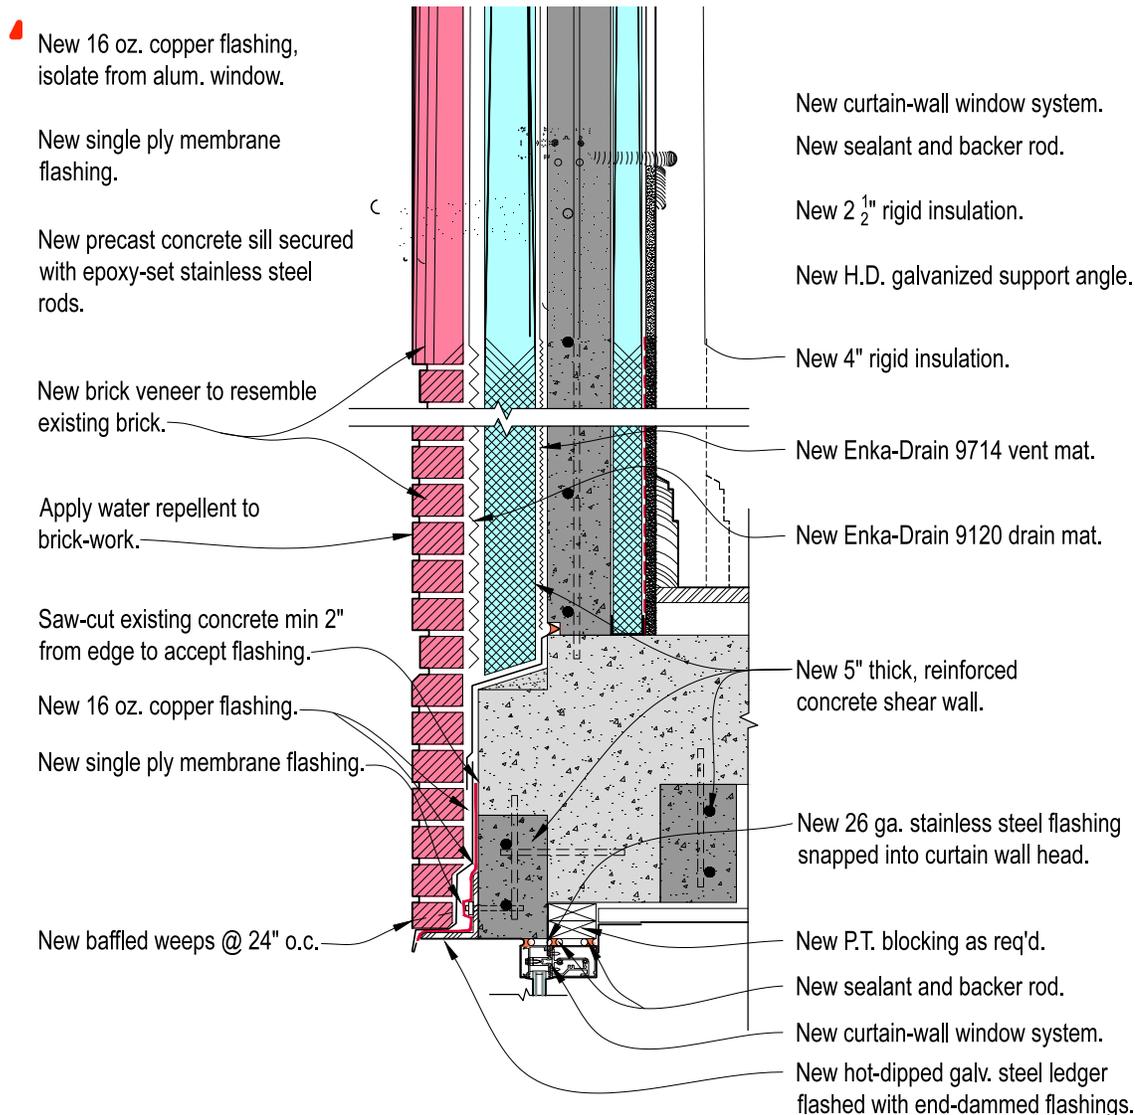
(1): Sill Replacement With Pre-Cast Concrete
